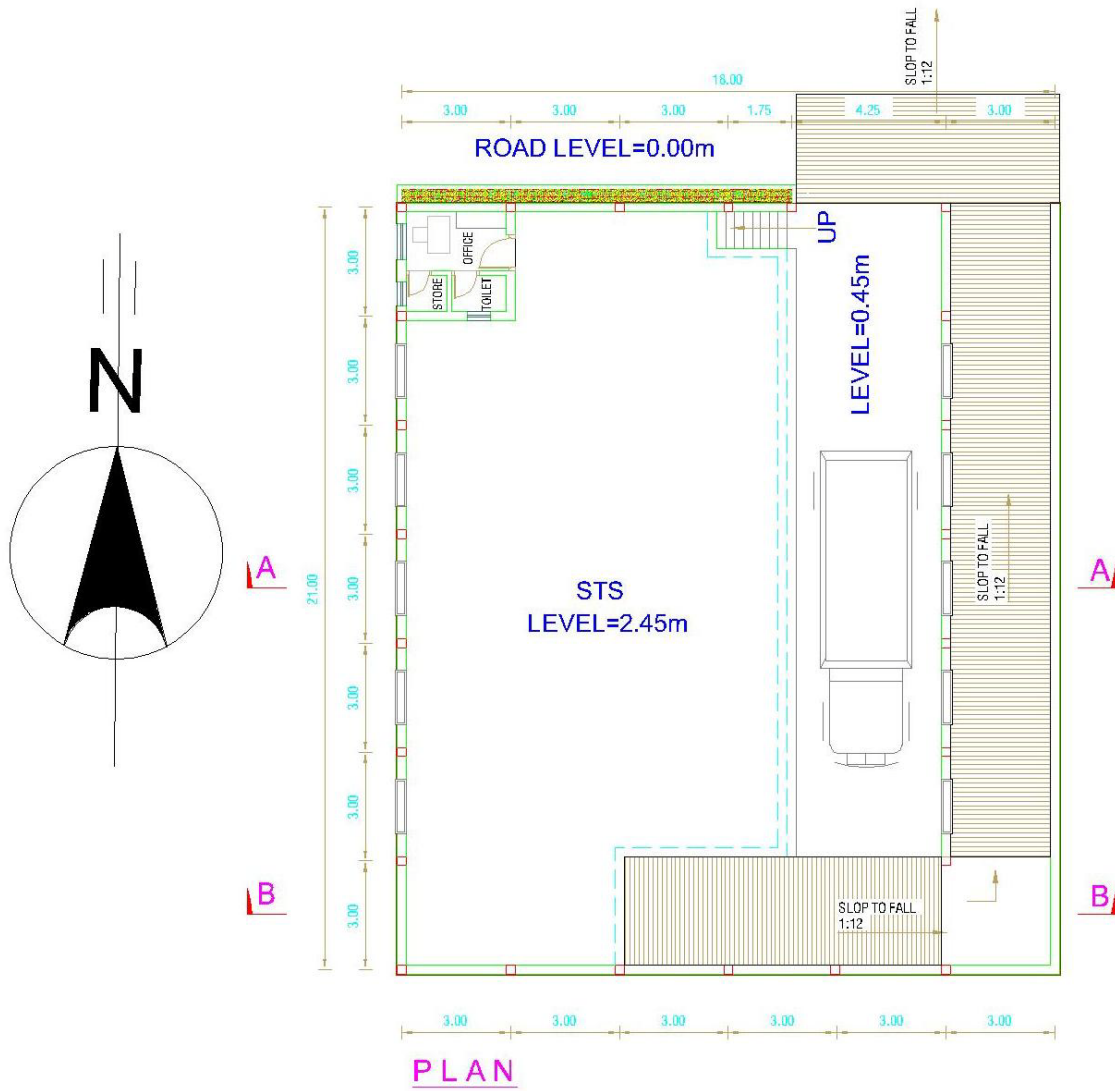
STS – 6 Berry Bandh Rayer Bazar Preliminary Plan
